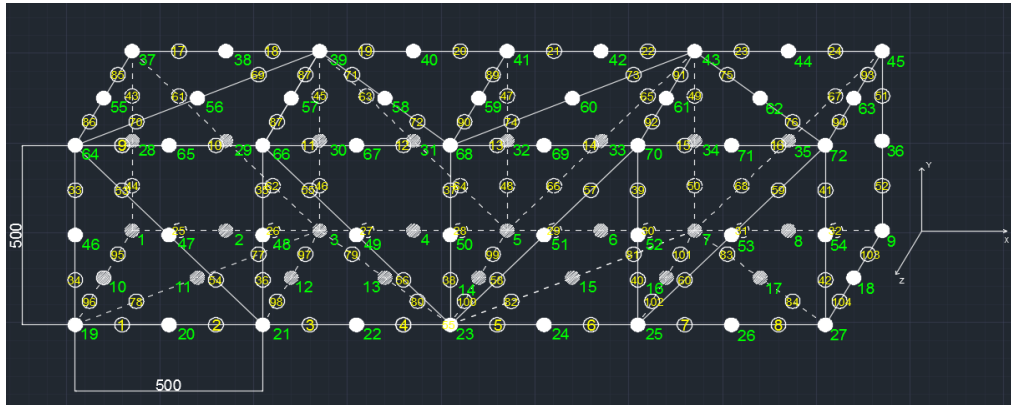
Geometry and dimensions of the numerical truss bridge model (unit: mm)
